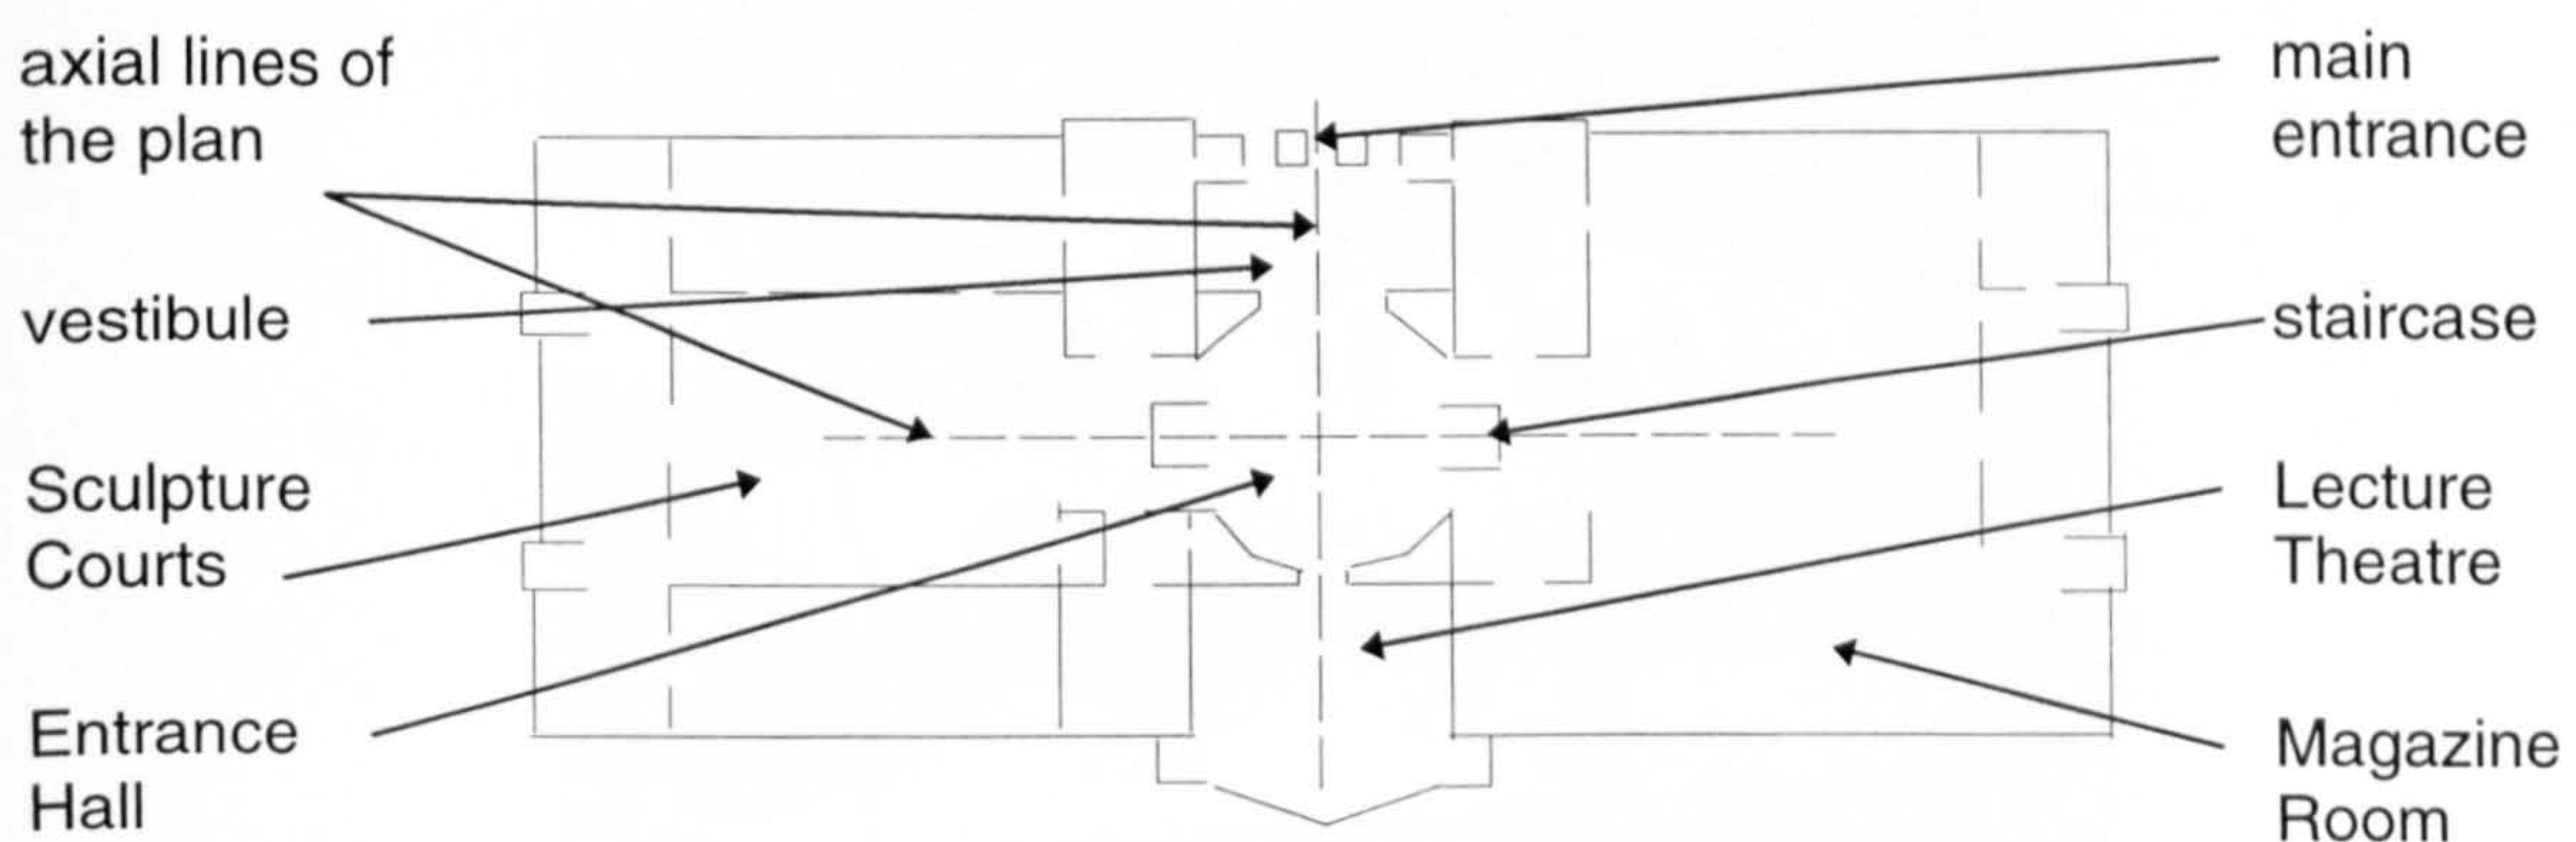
The ground floor plan of the new Library and Art Gallery.
